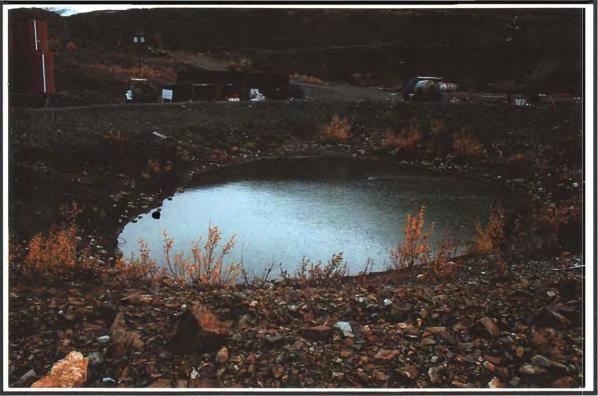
Polishing pond. Oil, lubricants and grease storage to right of photo behind pond. Mill reagent storage shed in background.
